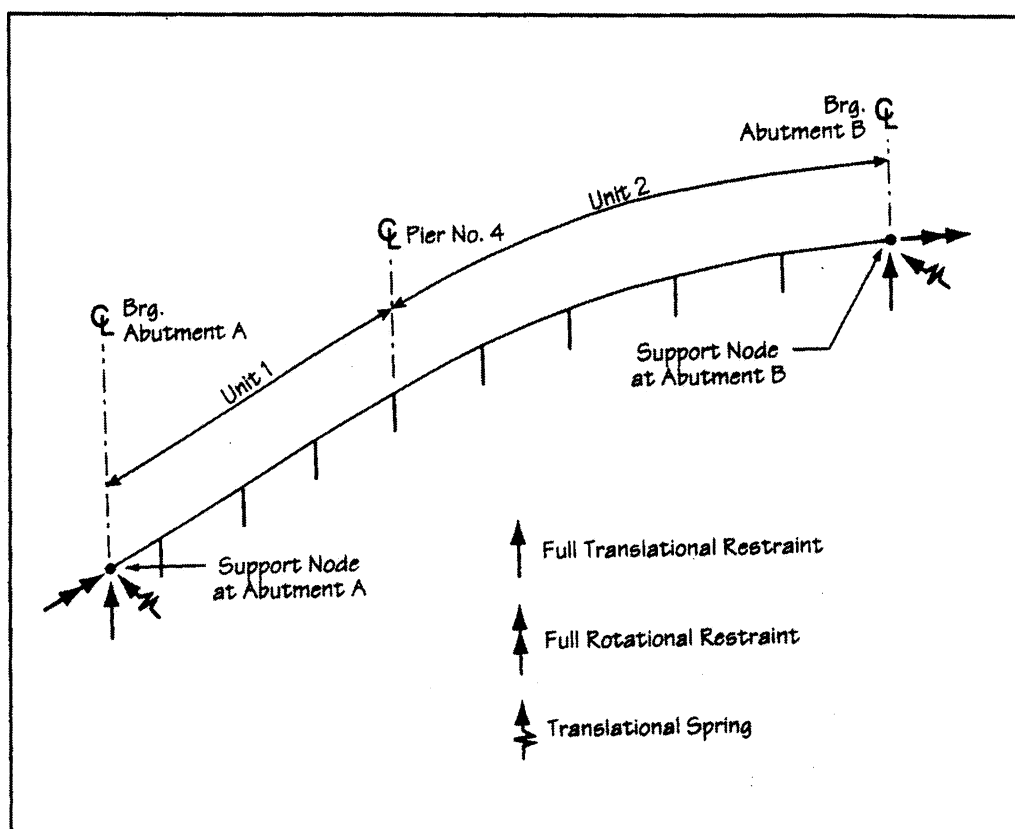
Bridge No. 5 – Details of Abutment Supports
